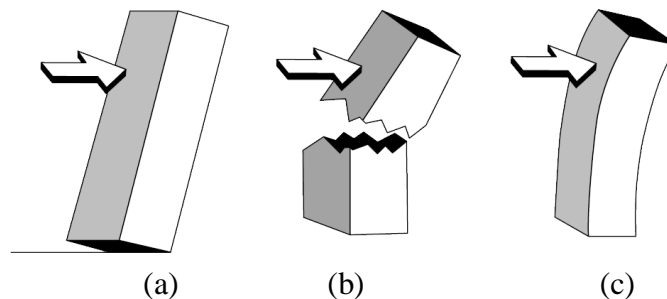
Fig. C. Bending resistance of building: (a) building must not overturn, (b) columns must not fail in tension or compression, and (c) bending deflection must not be excessive.
